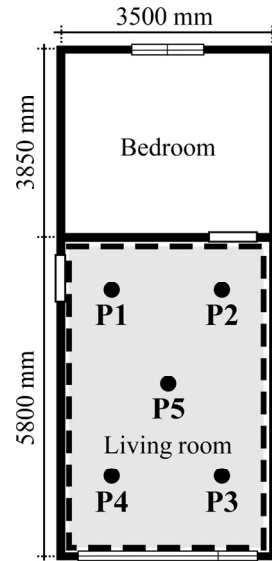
Floor plan and impact and measurement points by standard sources(ceiling structure installation area is inside the dotted line)
